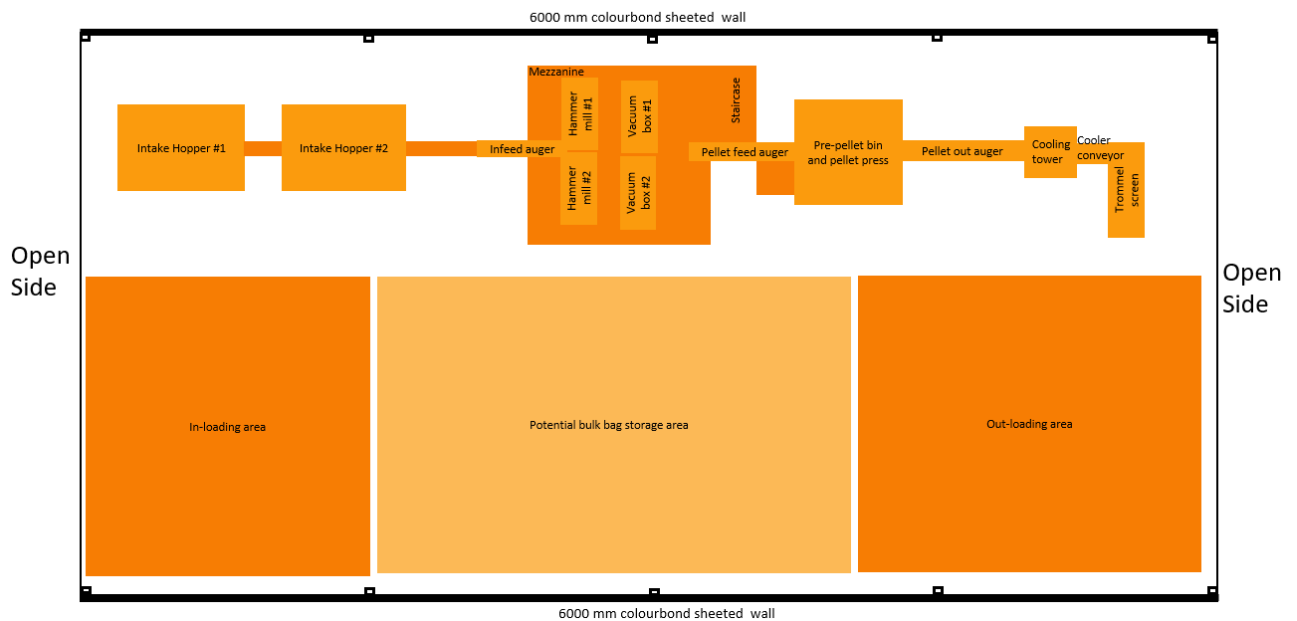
Floor Plan of Pelletising Shed (Larger Version at Appendix 1)
